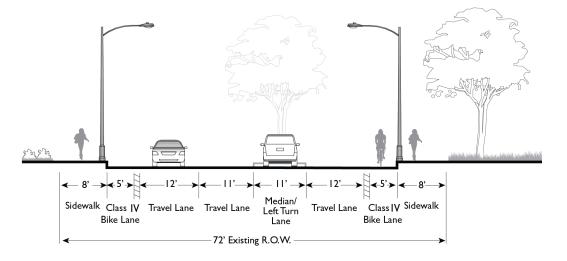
ISABEL AVENUE BETWEEN PORTOLA AVENUE AND GATEWAY AVENUE (LOOKING NORTH)
